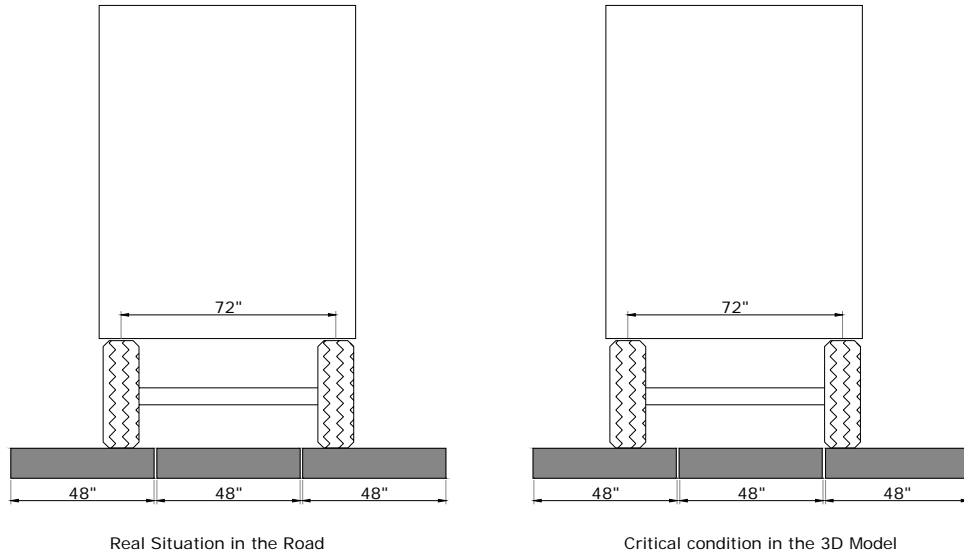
Axle Load Positioned on Slabs with 4-ft Joint Spacing.
